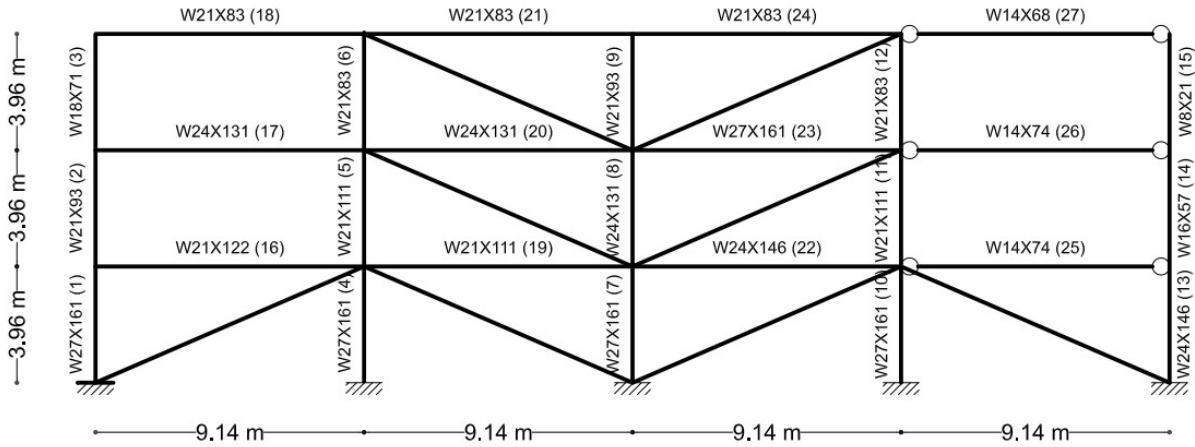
The frame layout, location of dampers, and beam and column section sizes, three-story frame
